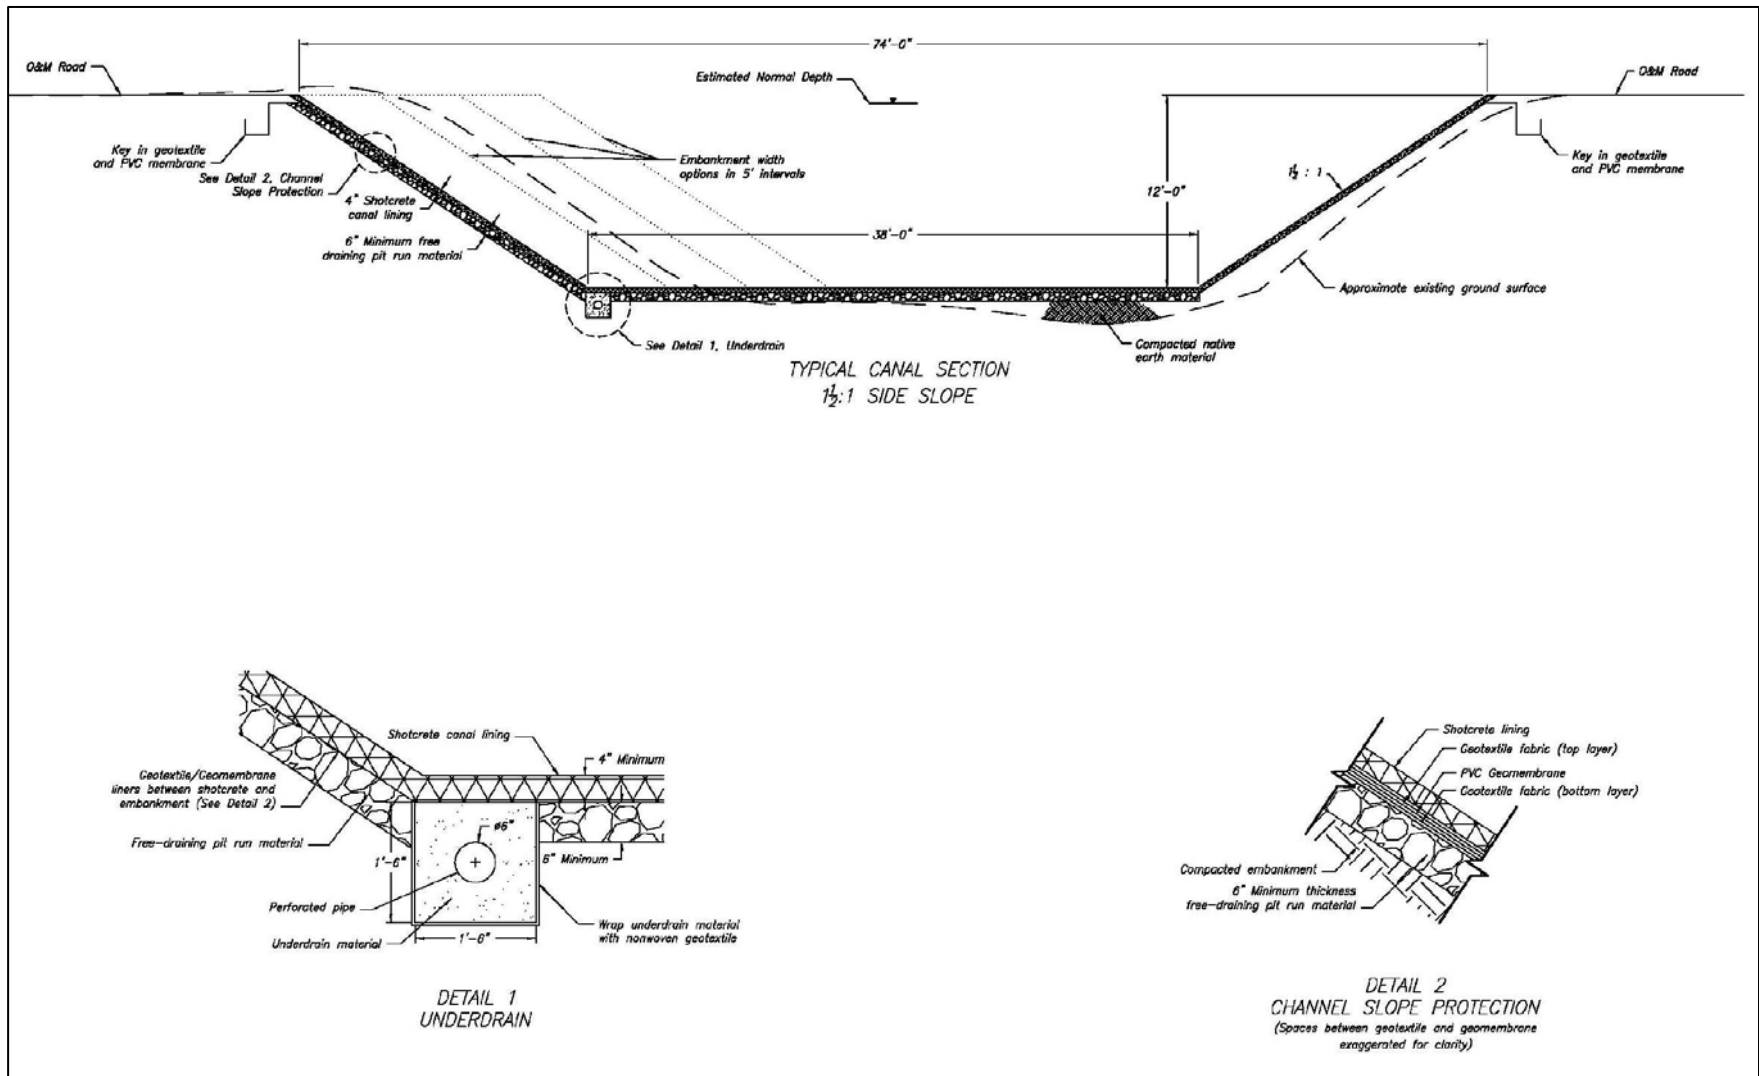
Typical Section for Proposed Canal Alternatives (Excerpt from Reclamation Drawing, 2015).
